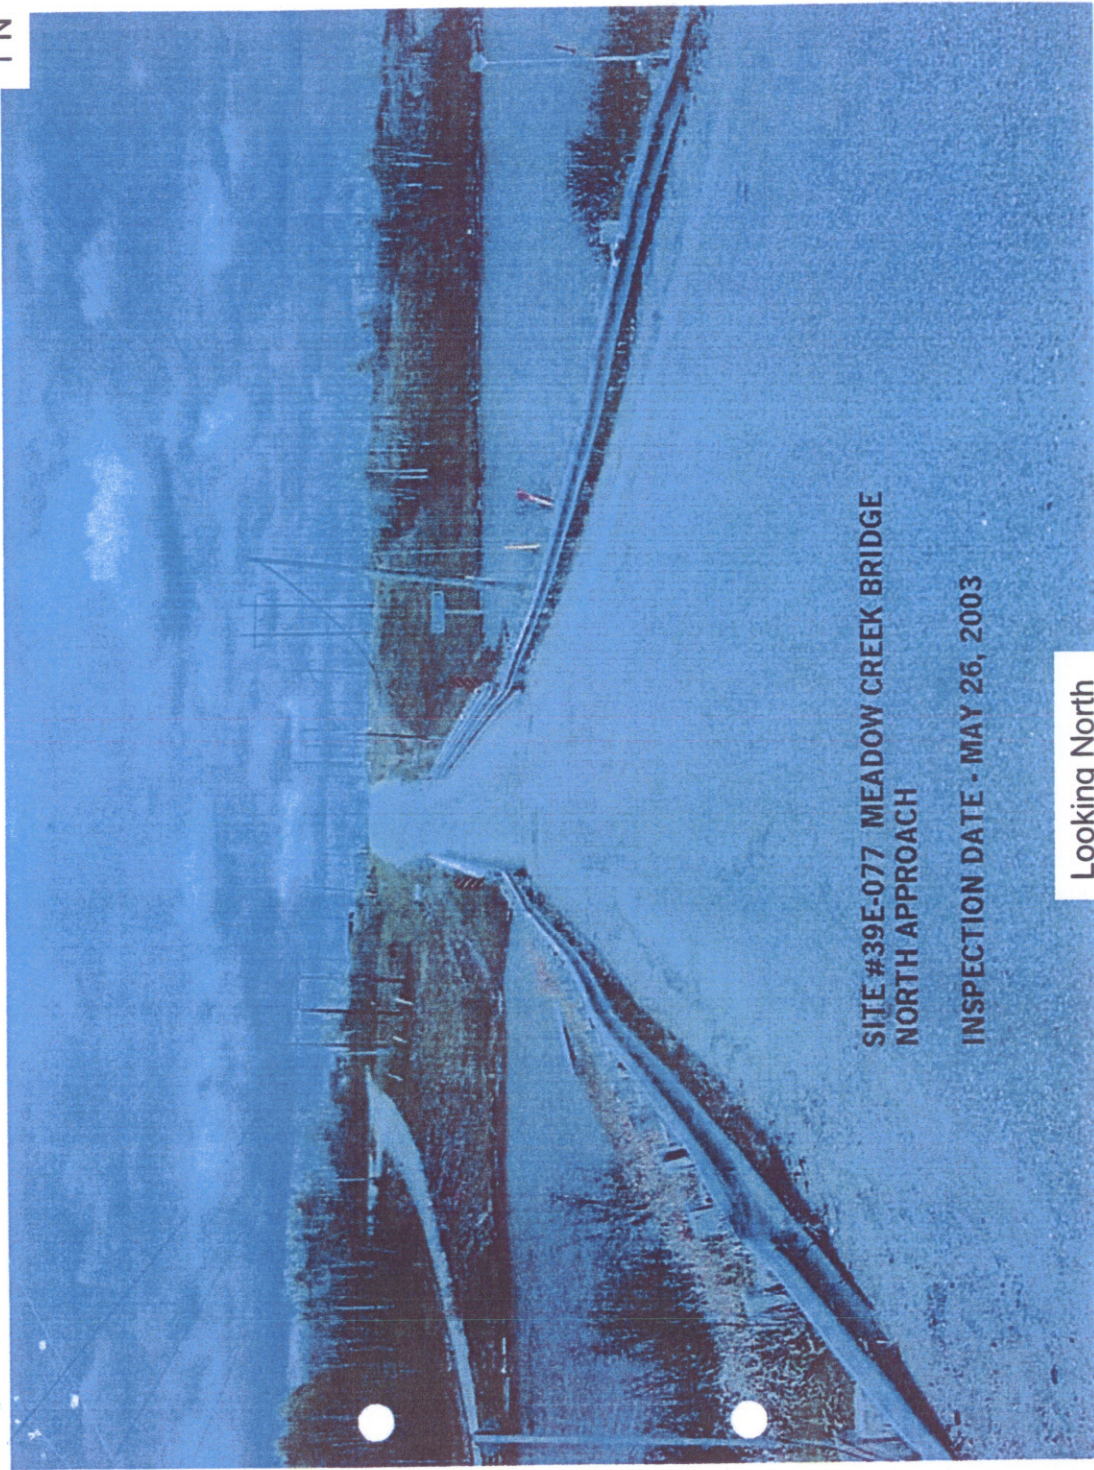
& 10 - Existing pavement condition along the approach embankment
